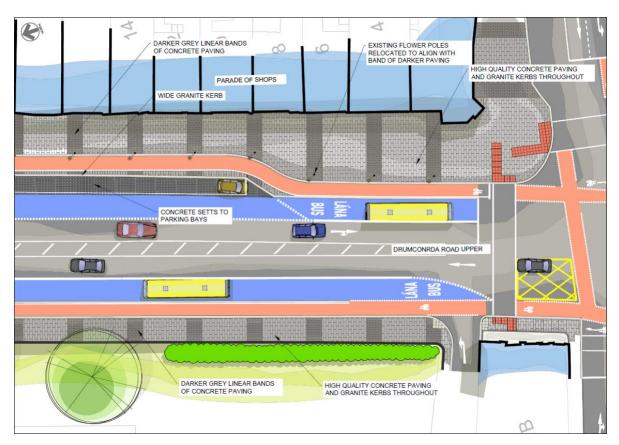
Drumcondra Road Upper Shopping Parade Indicative Design
